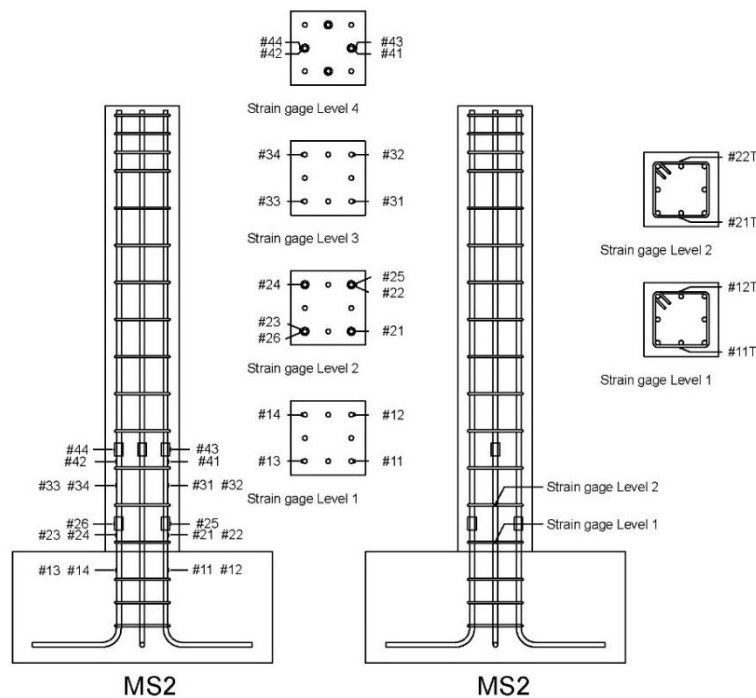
Detailing of strain gauge on reinforcements of MS2 column
